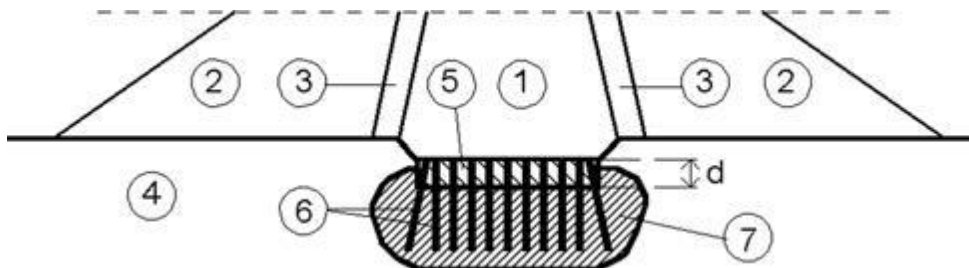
Consolidation grouting beneath the core of an embankment dam. (1) Clay core; (2) course grained material; (3) filter zones; (4) rock in the foundation; (5) concrete layer; (6) boreholes; and (7) consolidated foundation [12].
